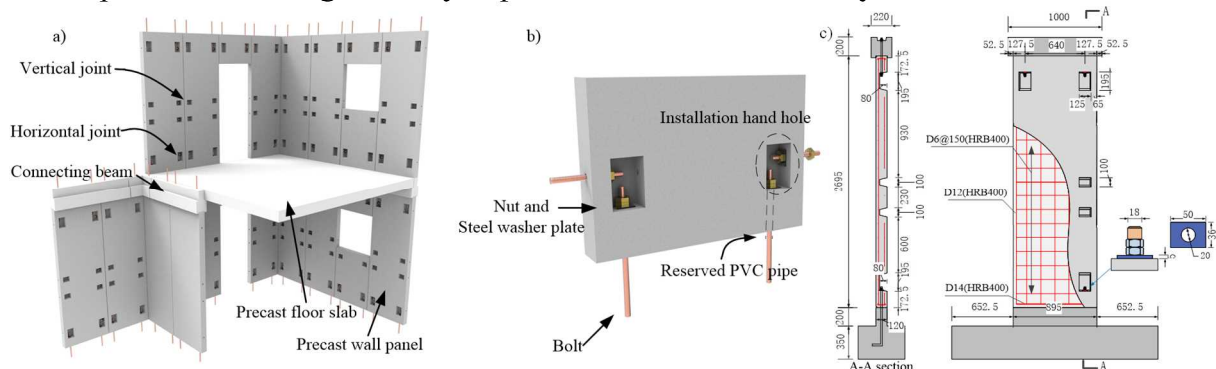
Bolted PC panel building system. (a) typical configuration; (b) post-installed bolted connection; (c) specimen detail
